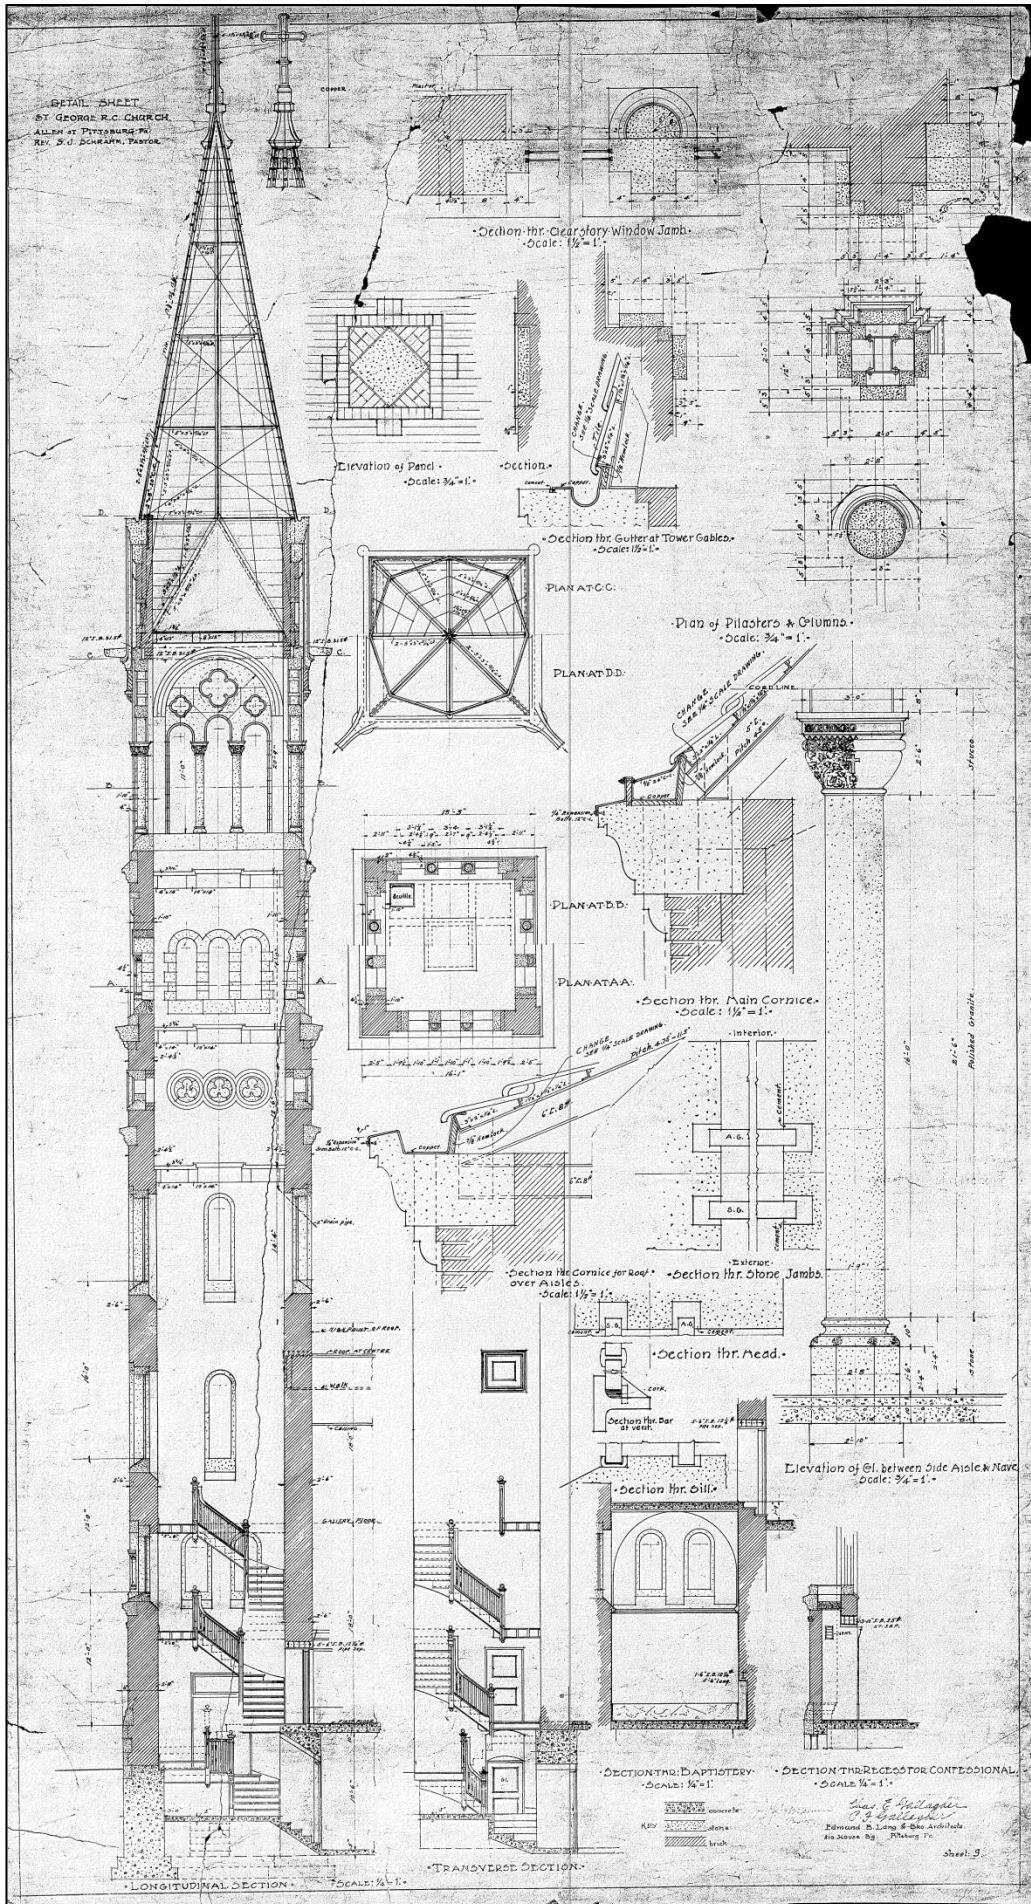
823 Climax Street, Architectural Rendering, Assorted Sections, 1910
